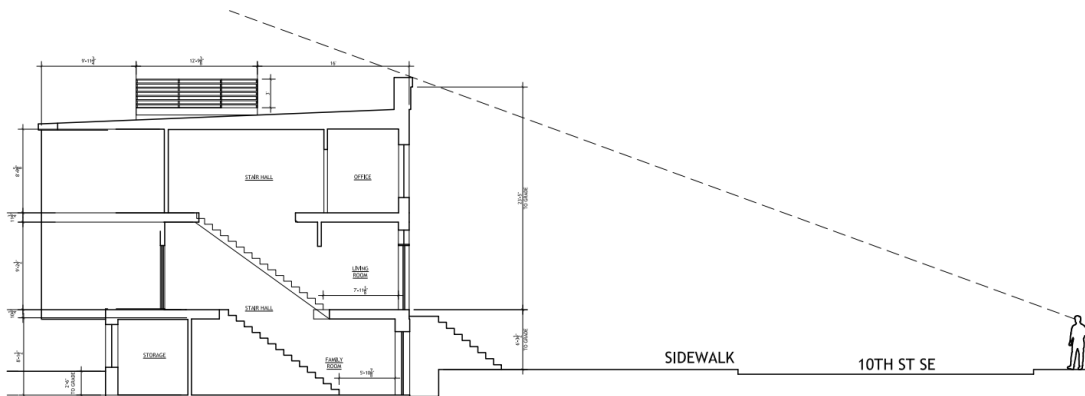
Sightlines of the roof deck from 10th Street provided by the architect.
